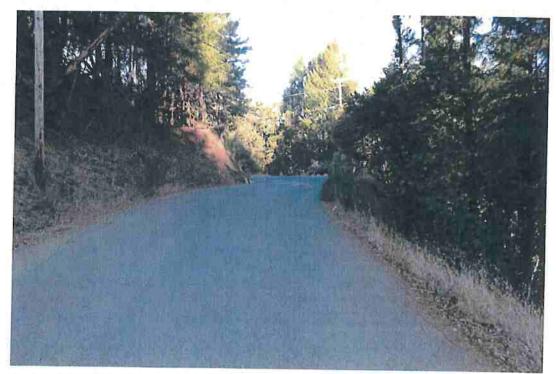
Mile 2.37: ~15-ft road width pinch point past partial road failure.
